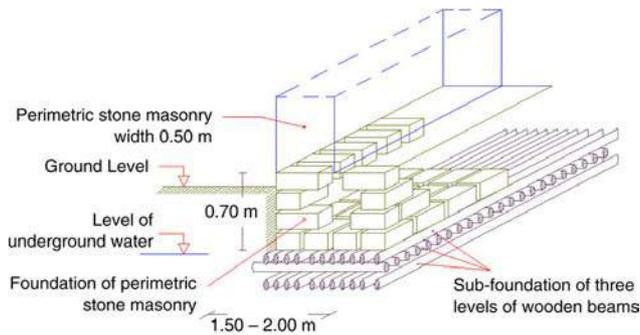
Details of the foundation of traditional buildings of the town of Lefkas (Greece).
